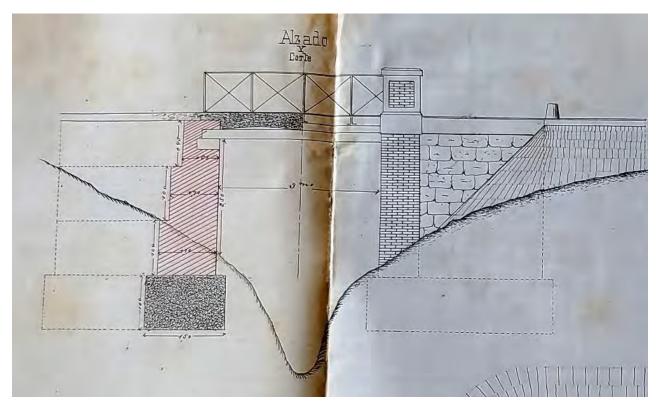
Above, partial view of an 1888 Larrinaga's proposal for a three-meter span culvert, with a metallic upper-deck.
